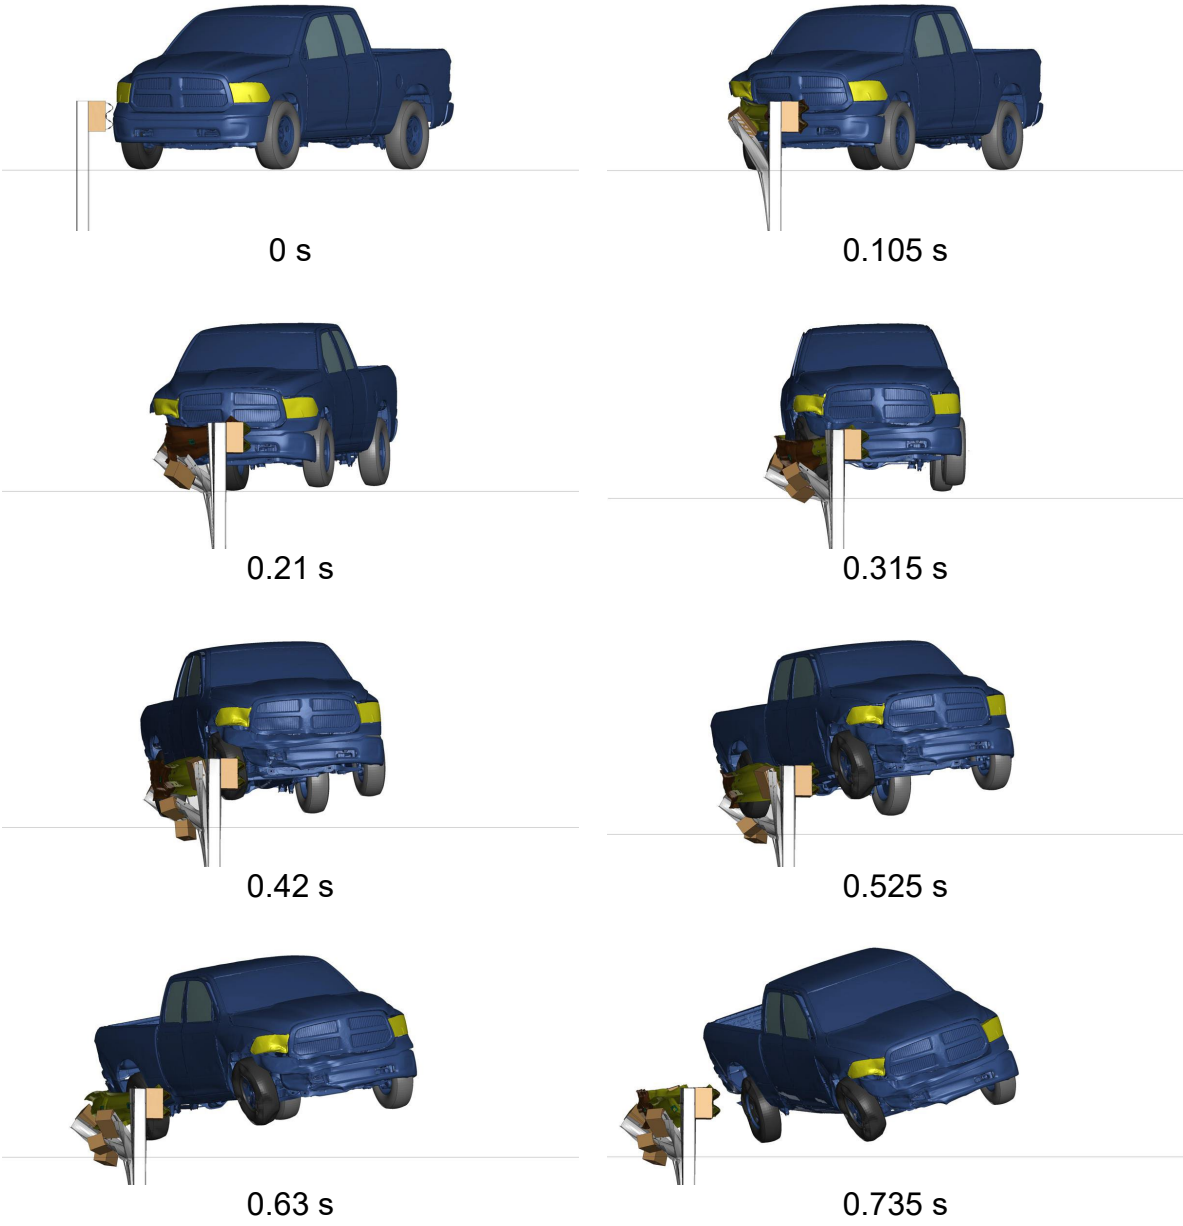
87.5-ft Guardrail System with Refined Slot and End Washer – Downstream View of *MASH* Test 3-11
